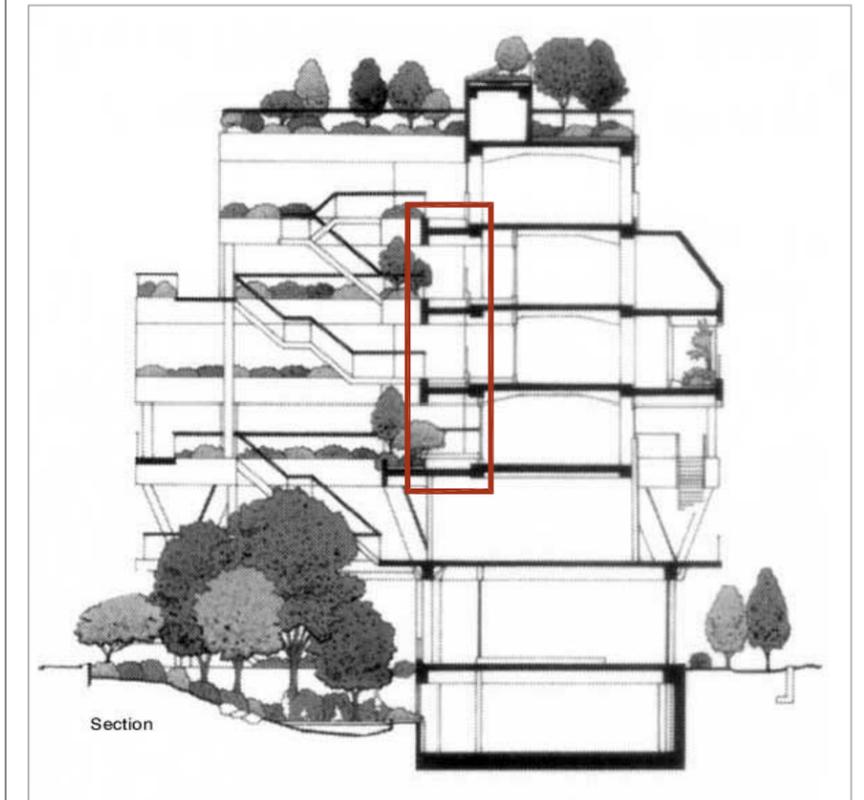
Building section highlighting terrace gardens. Note spaces at the external gallery that act as the horizontal utility zones at each level.
